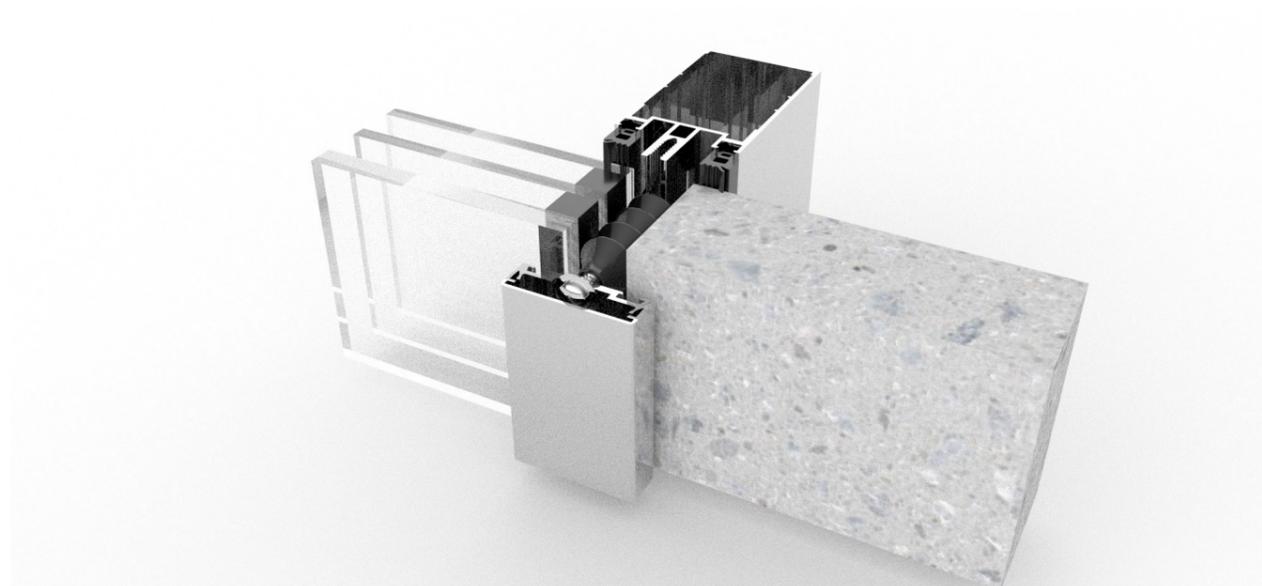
A hybrid facade panel can be placed and mounted exactly like a current glazing with a curtain wall system.
